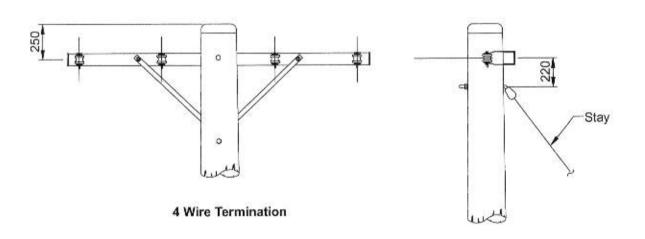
Open Wire Termination Structures (Where conductors are terminated)
